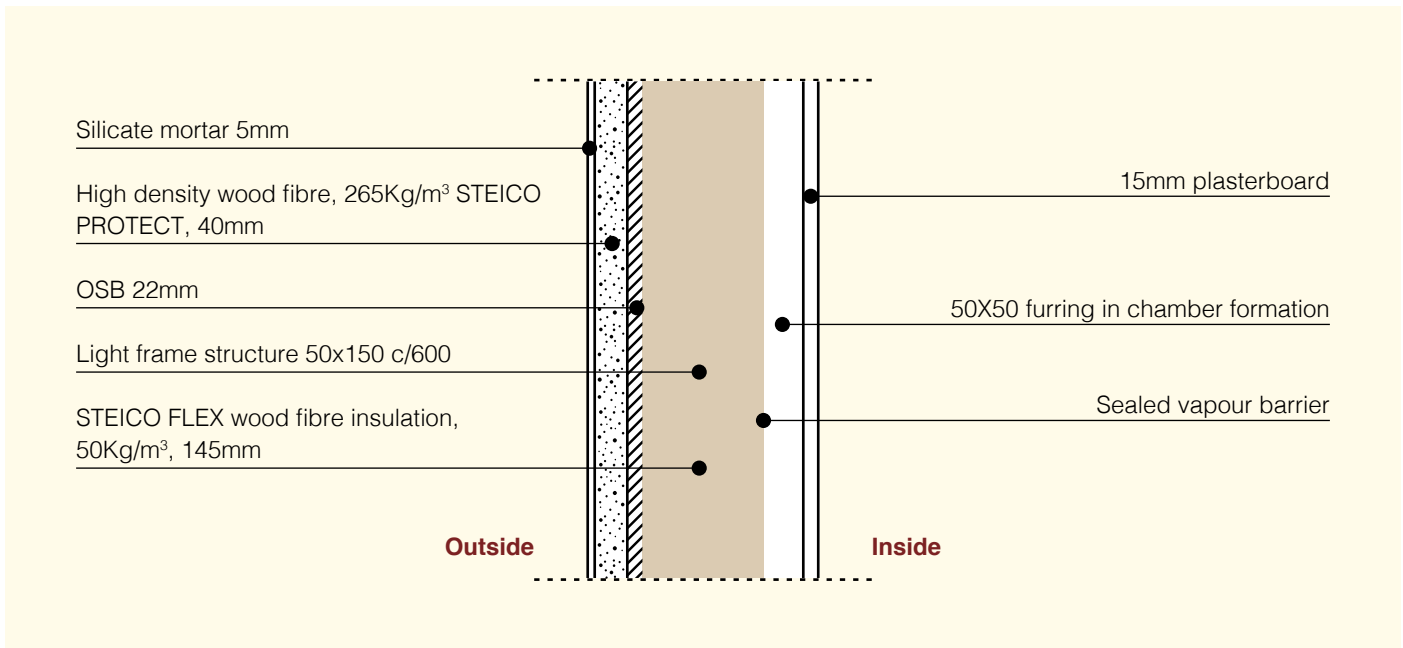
Elevation section of the façade of the house. Source: House Habitat.
